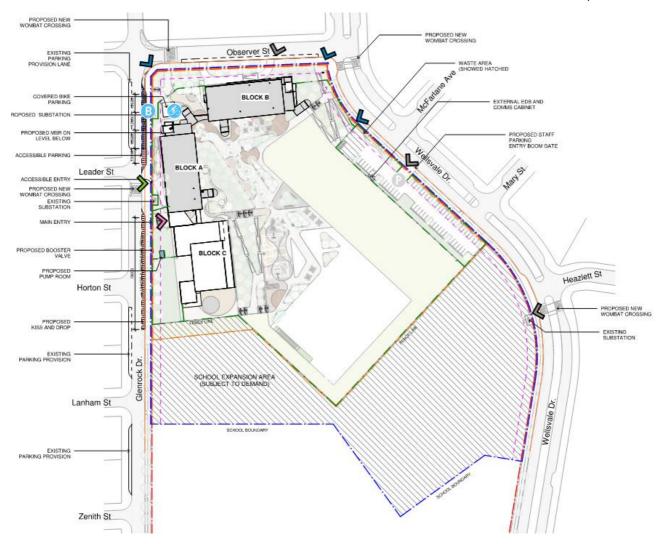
Proposed site plan with pedestrian and vehicular access points denoted.
